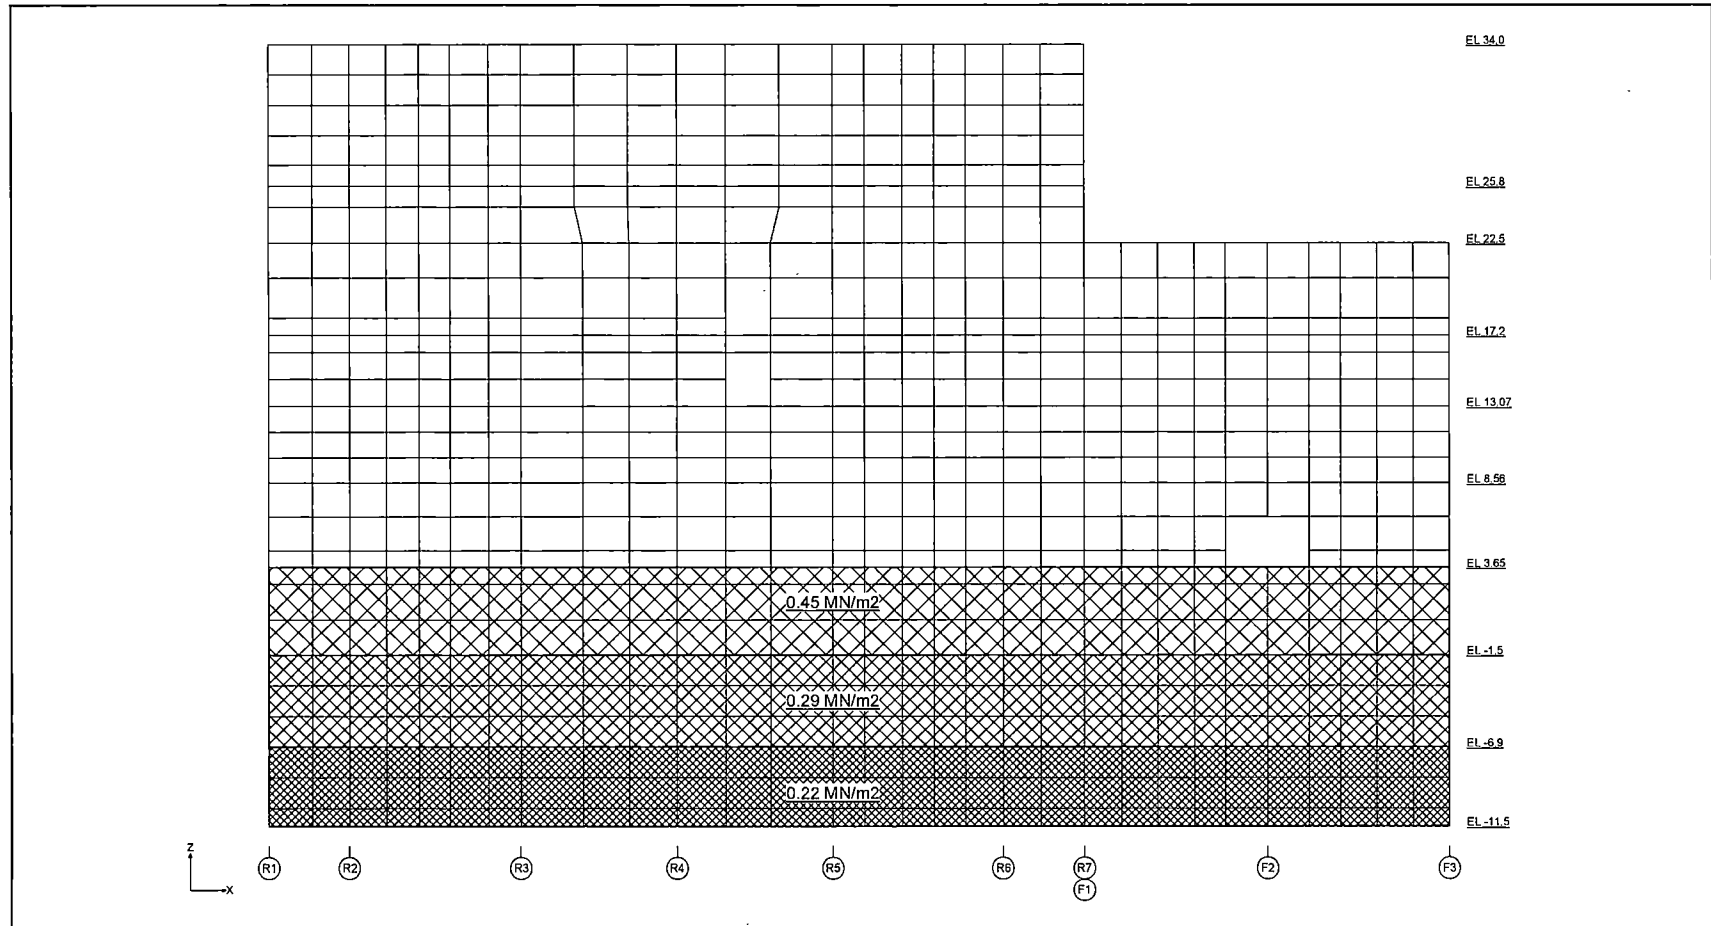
Soil Pressure Due to E-W Direction Earthquake on the External Wall (RG/FF Column Line)
